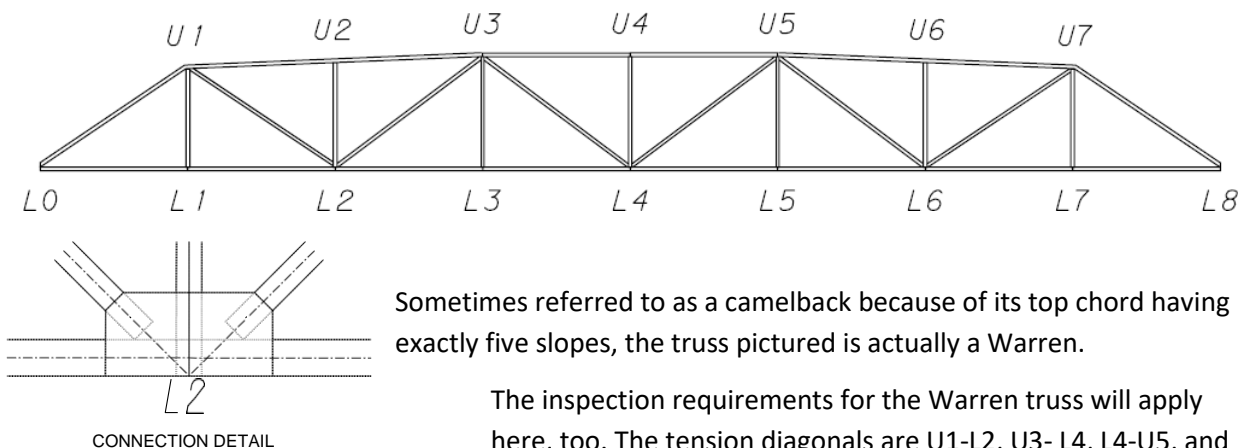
An example of a warren truss bridge section with connection details.
